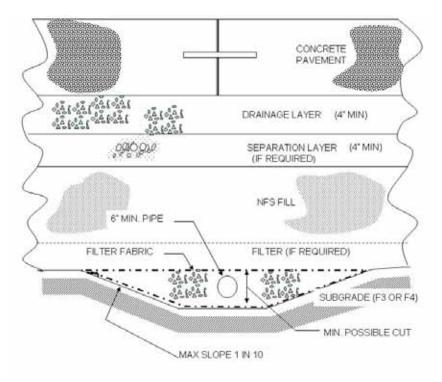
Typical Interior Subdrain Detail for Rigid Pavement (Non-Frost Areas)
